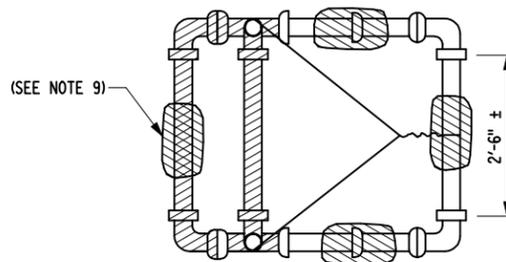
DETAILS FOR FASTENING LIGHTS ON TOP OF BARRICADE
